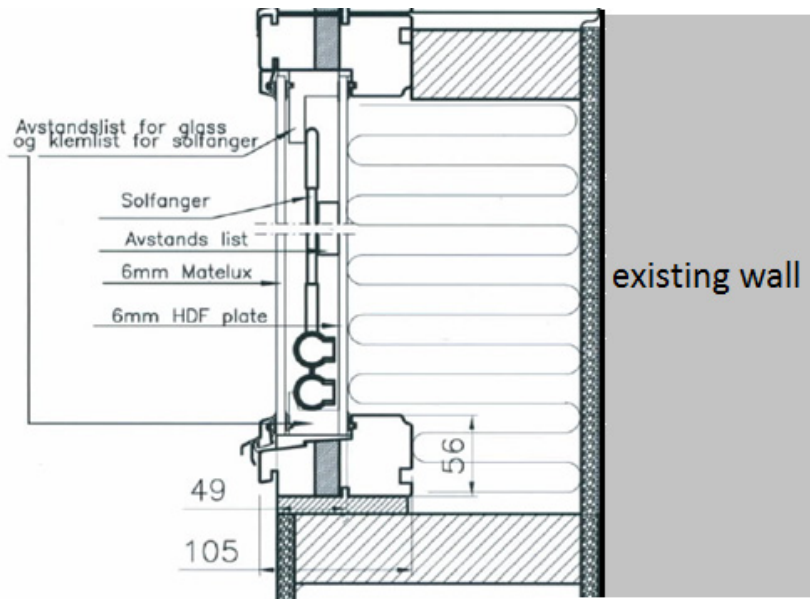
Add-on retrofit where a NorDan solar collector element is mounted on the outside of the existing wall.
